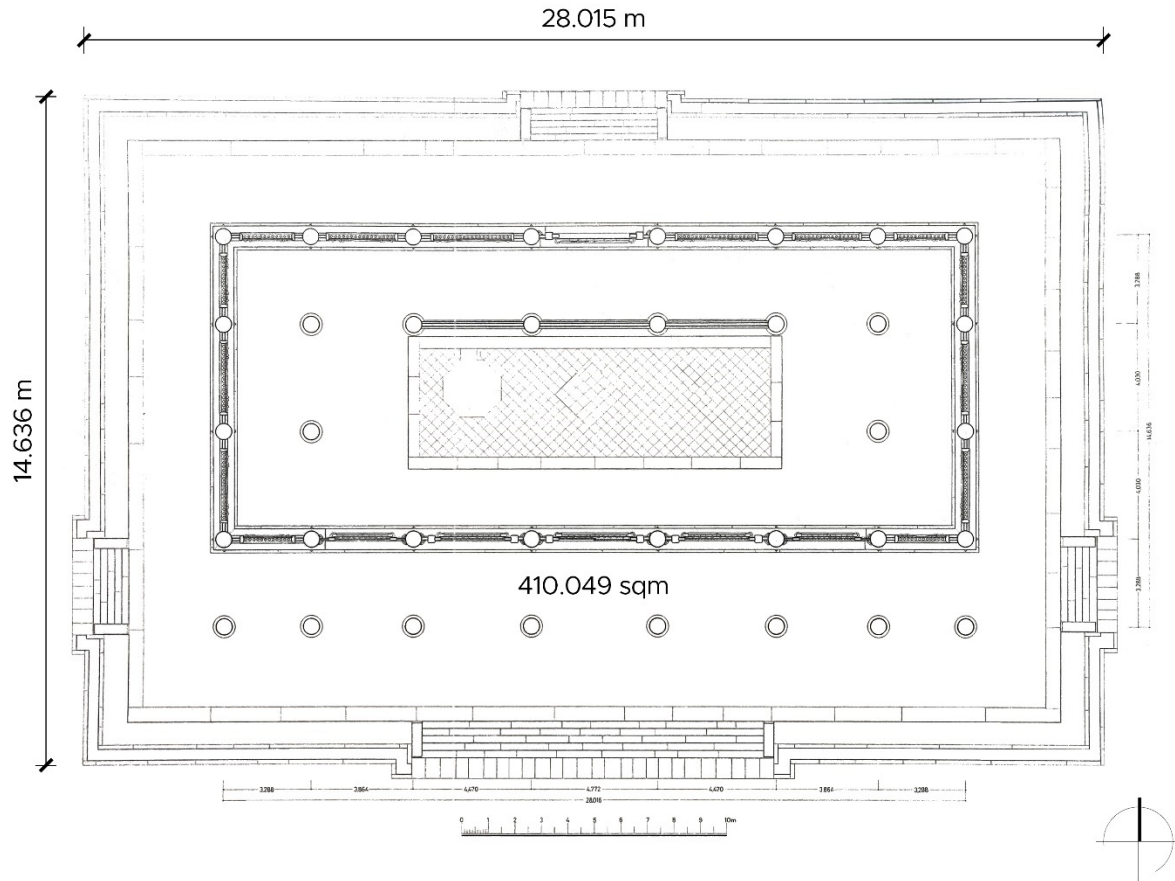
Floor Plan (Office of Cultural Assets Preservation, 2009)
